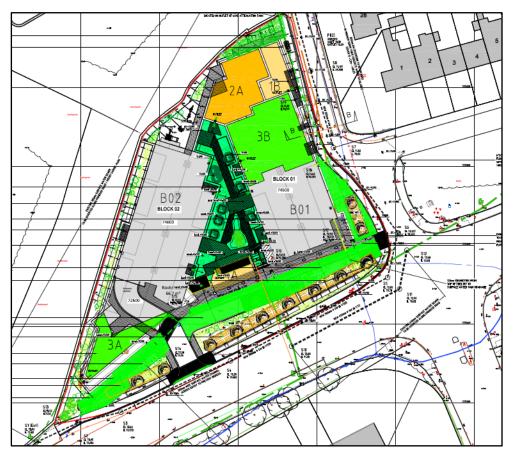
Extract from the Surface Water Drainage Layout, prepared by PHM Consulting
